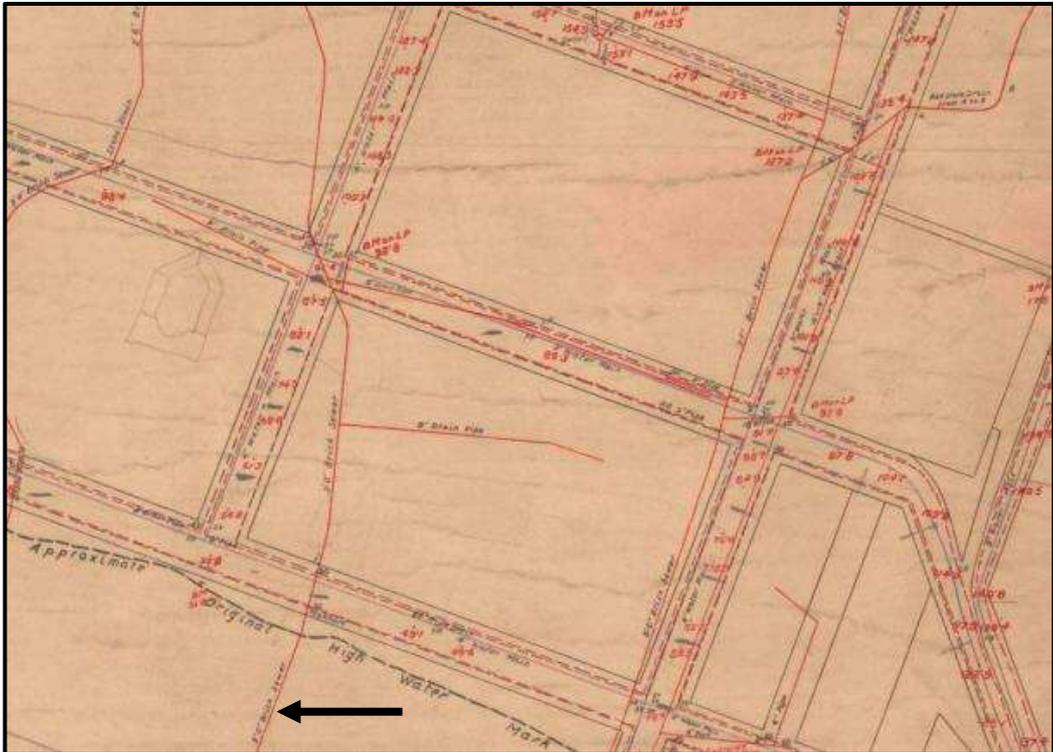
Detail from “Plan of Drains, Water Pipes and Levels in Lyttelton”, 1905 (Christchurch City Council). Black arrow shows Canterbury Street drain between London Street and Norwich Quay.
